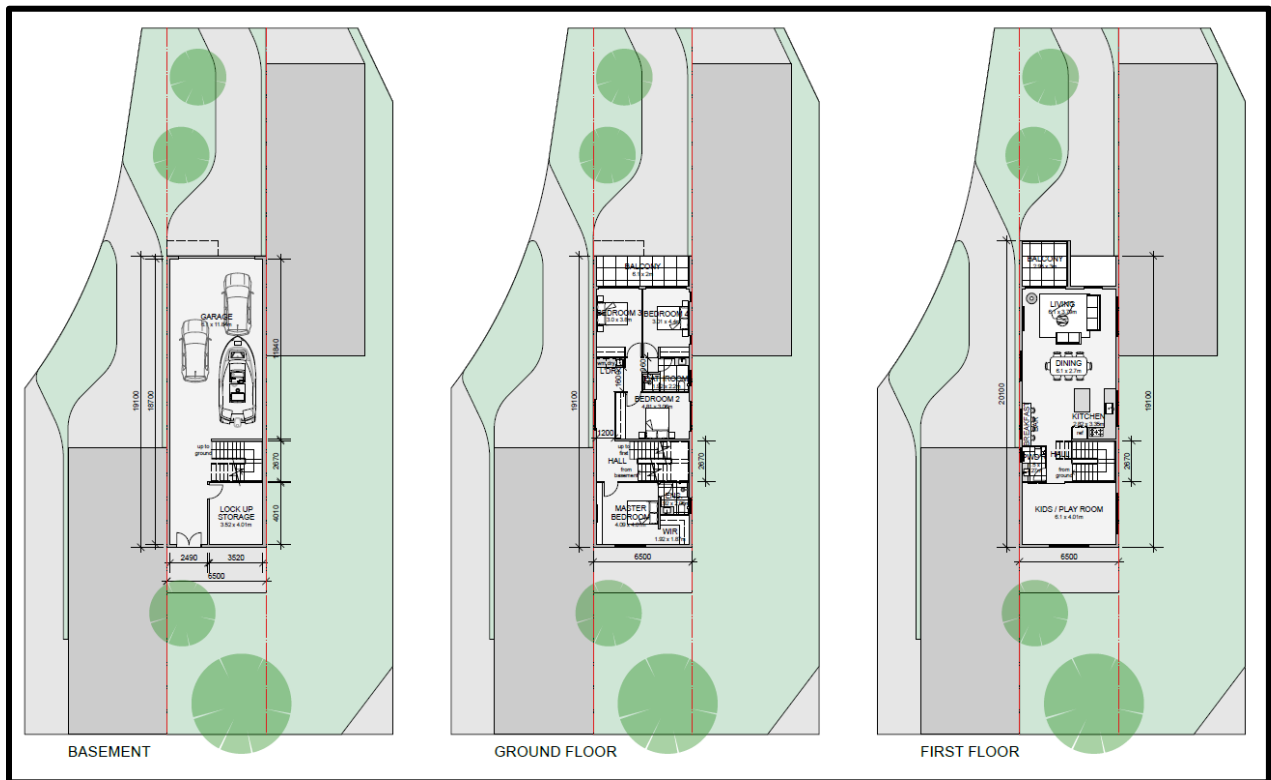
Typical Multi Dwelling Housing Floor Plans (Source: Robert Harwood Architects)
